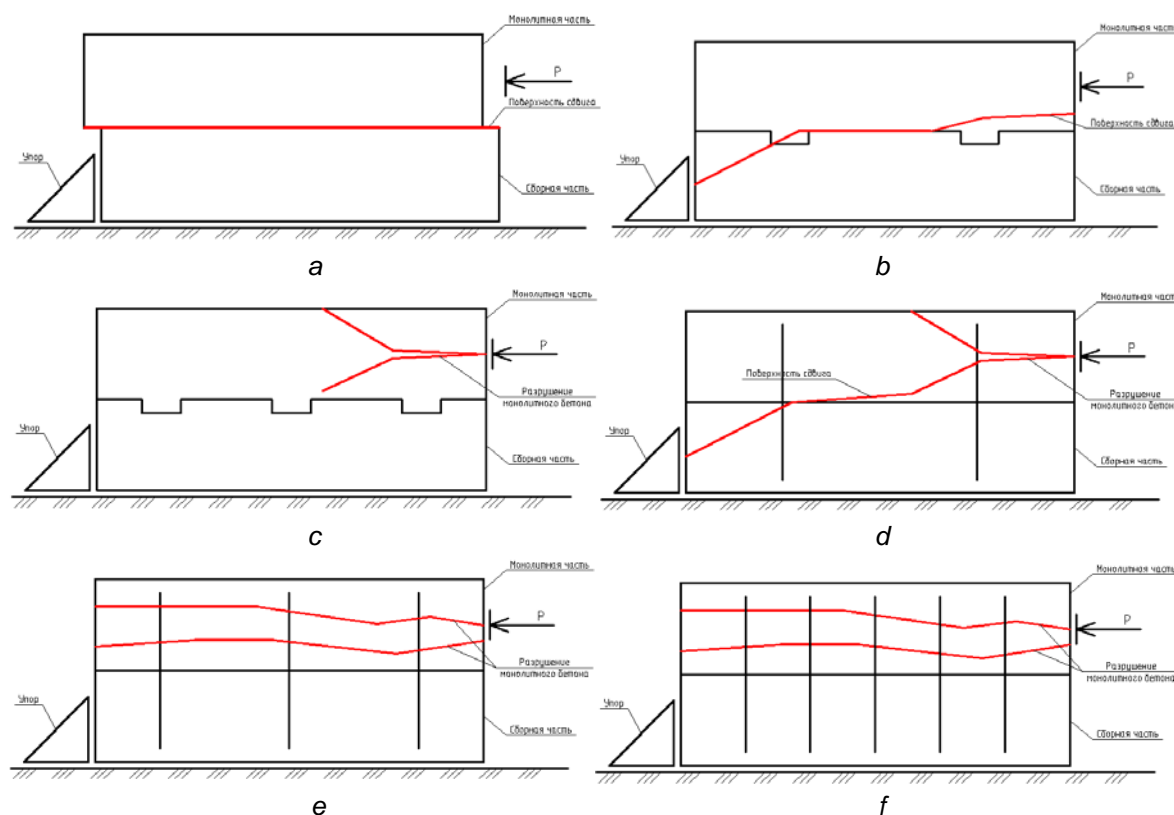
The typical fracture patterns: a – P1 samples; b – P2 samples; c – P3 samples; d – P4 samples.
